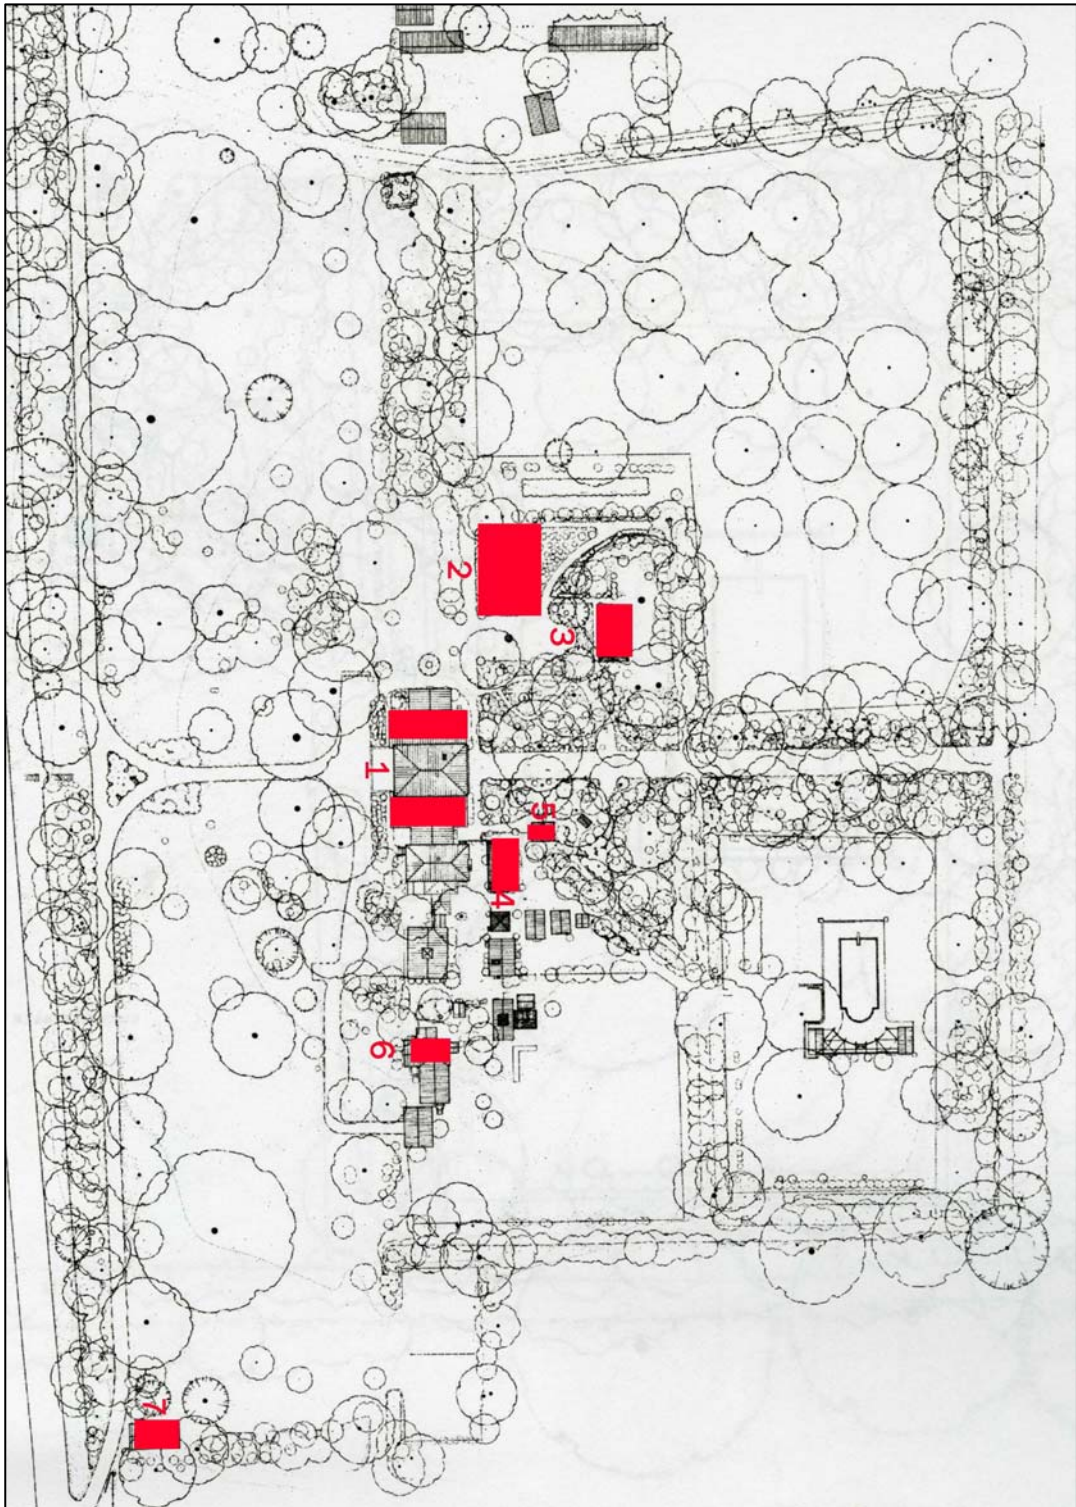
The grounds plan from the HABS drawings featuring the pisé structures on site.
